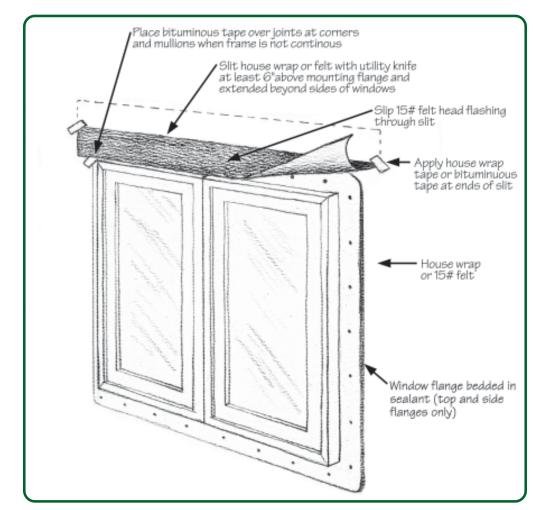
Window Flashing Illustration (building wrap installed prior to window; typical nail flange installation)
